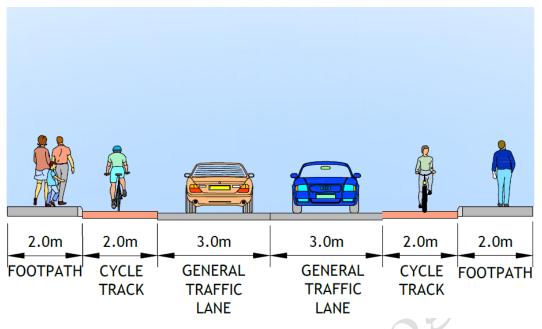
Cross-Section G-G (relevant to RG2 & RG4)
